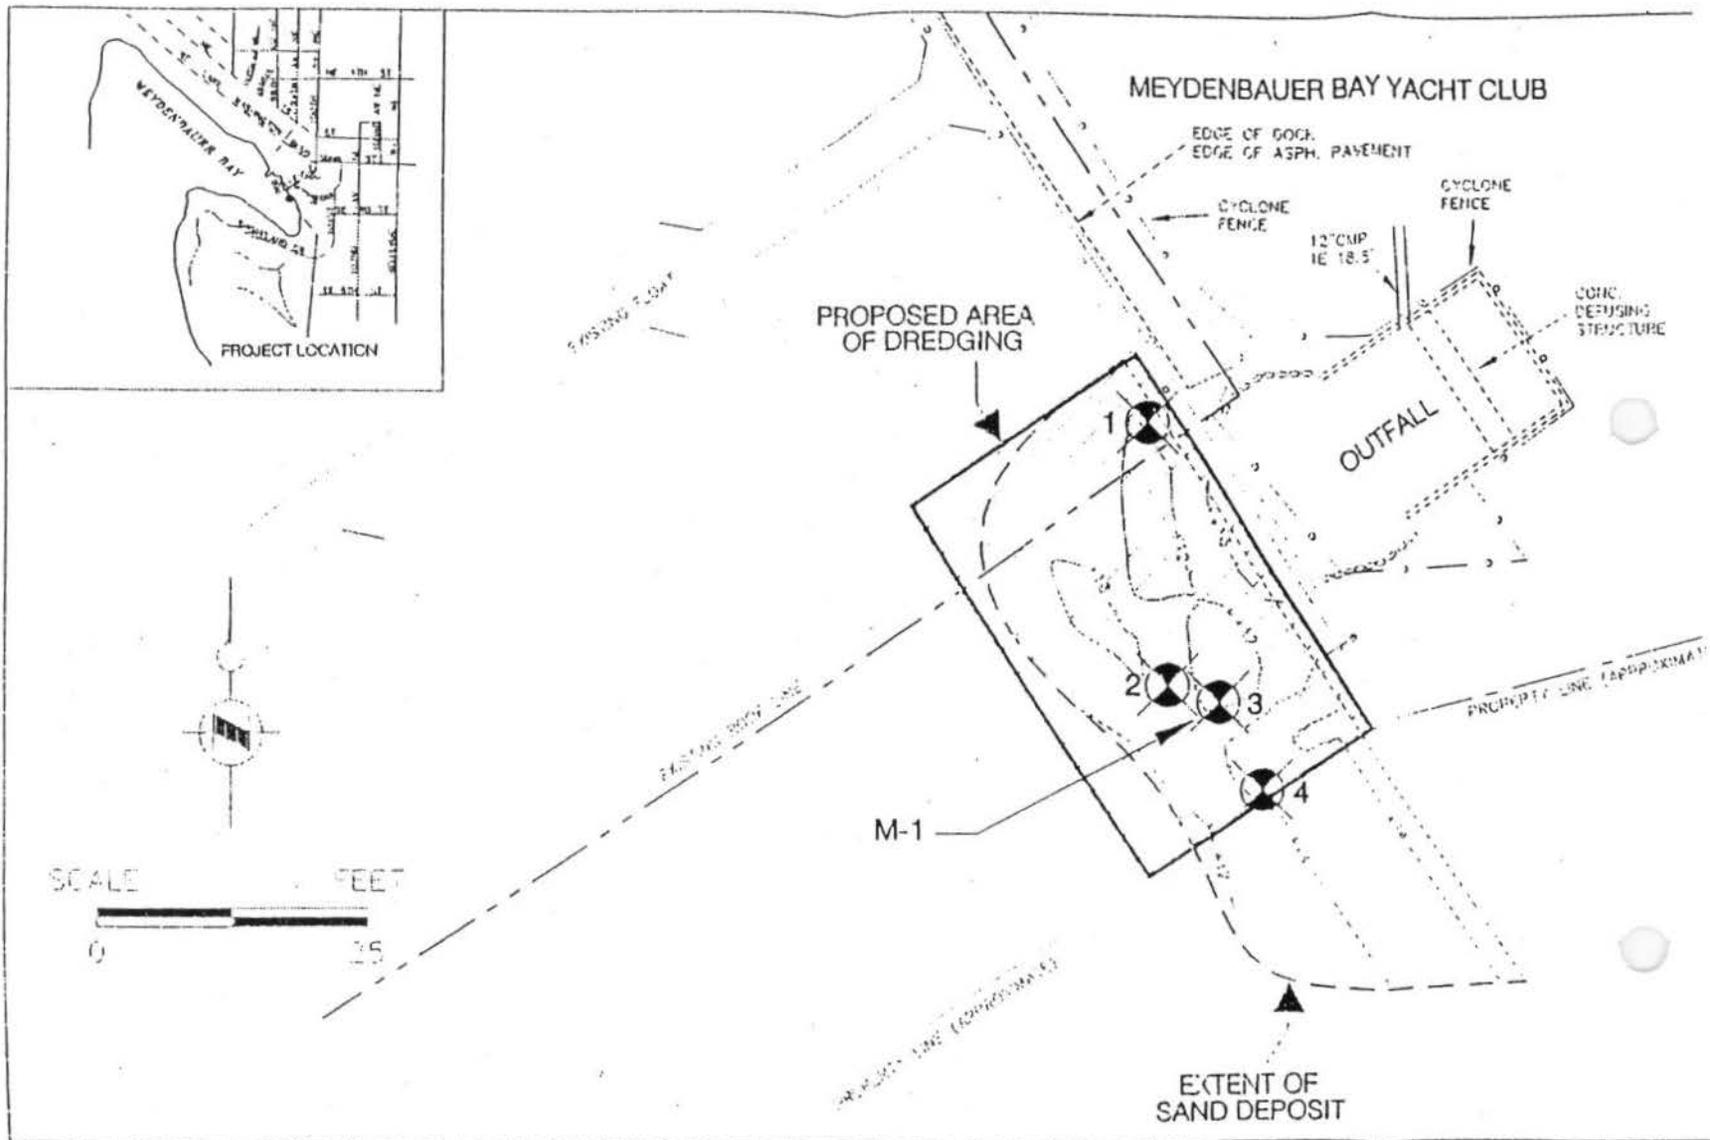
Meydenbauer Bay stormwater outfall sediment sampling locations.
